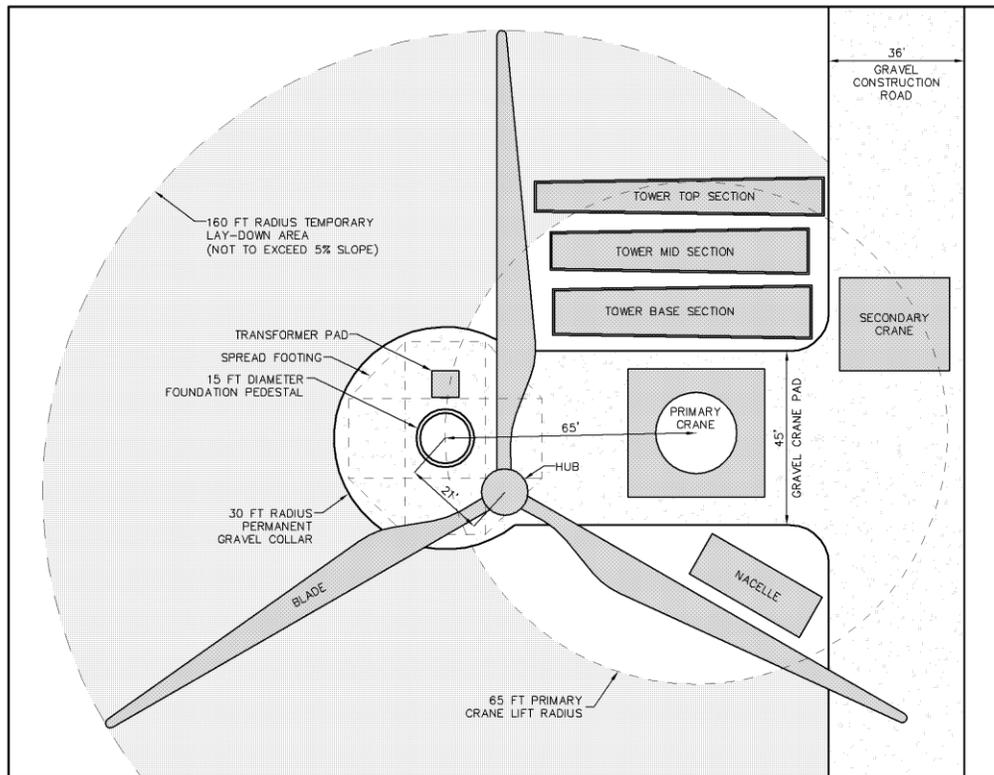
Wind Turbine Generator Component Staging and Assembly
